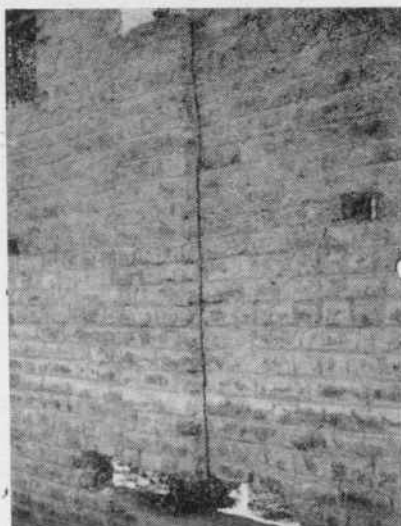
Crack in column-wall junction of a building under construction.
